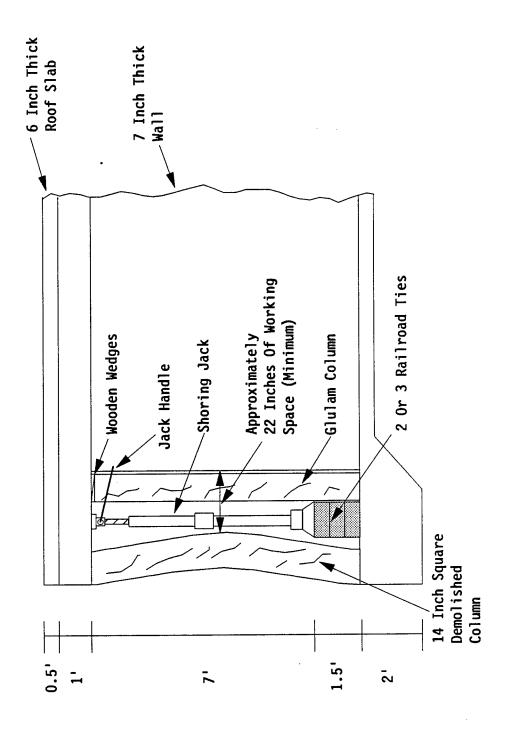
Detail of Column Replacement with Shoring Jack in Place.
